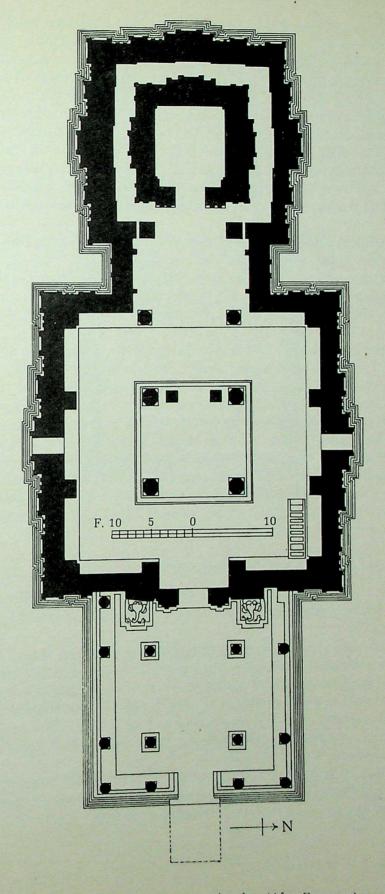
Paṭṭadakal. Jaina temple, plan. (After Cousens.)
